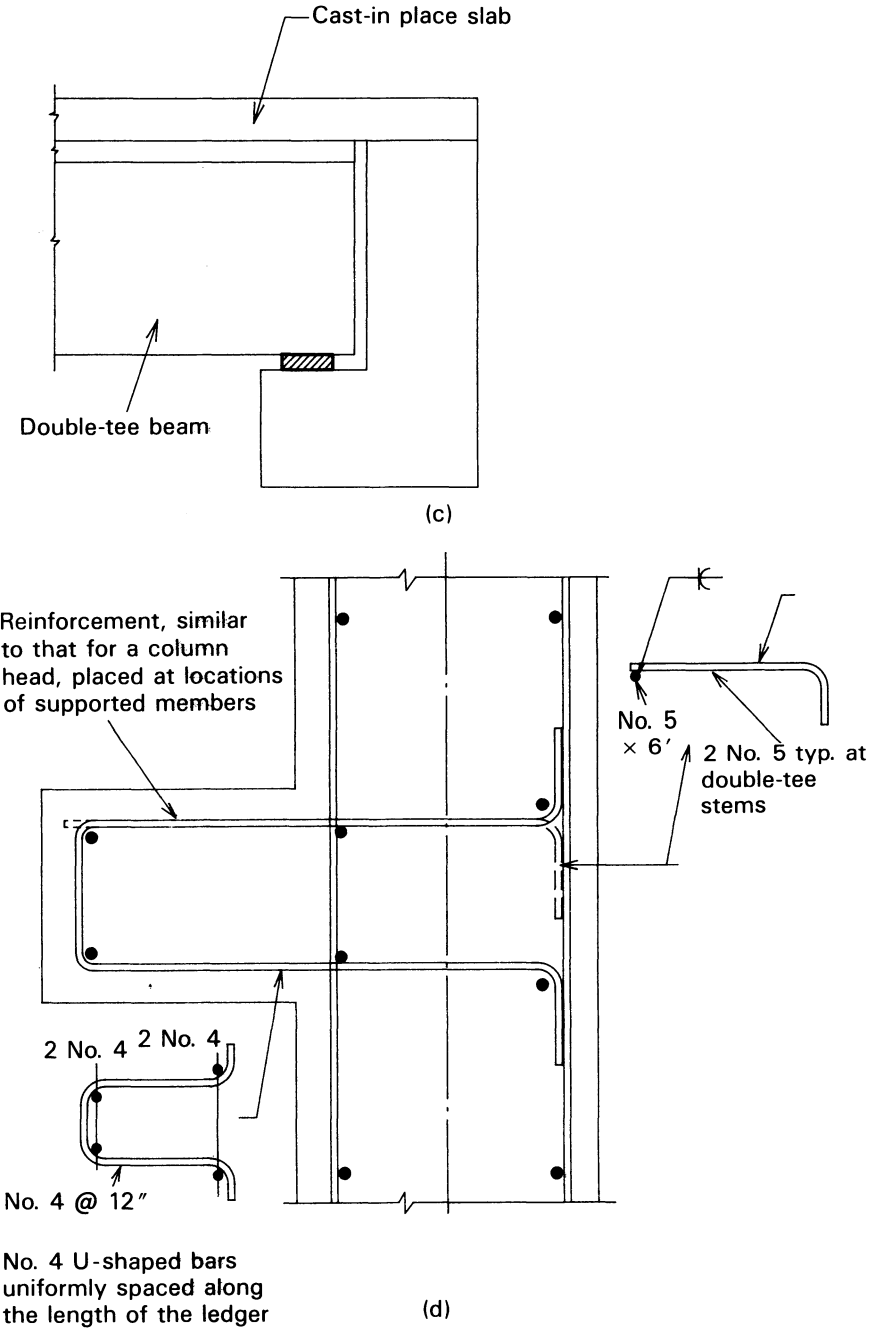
(Continued) (c) Ledge at L-shaped beam supporting a double-tee beam. (d) Reinforcement in a cast-in-place ledger.
